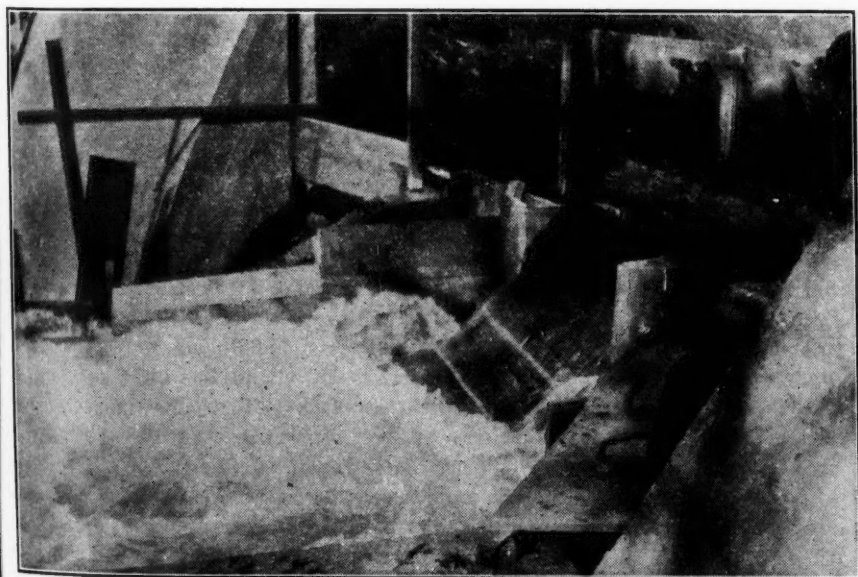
PIT NO. 4 TEST DAM: EXPERIMENT NO. 40. SAME AS FIG. 26, EXCEPT RIGHT SPLITTER PIER REMOVED.
